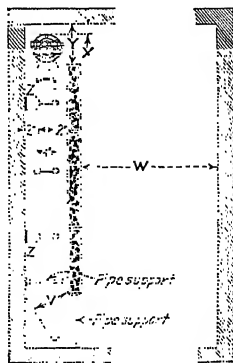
Location in refrigerator of plate or deep-finned cooling coil.
